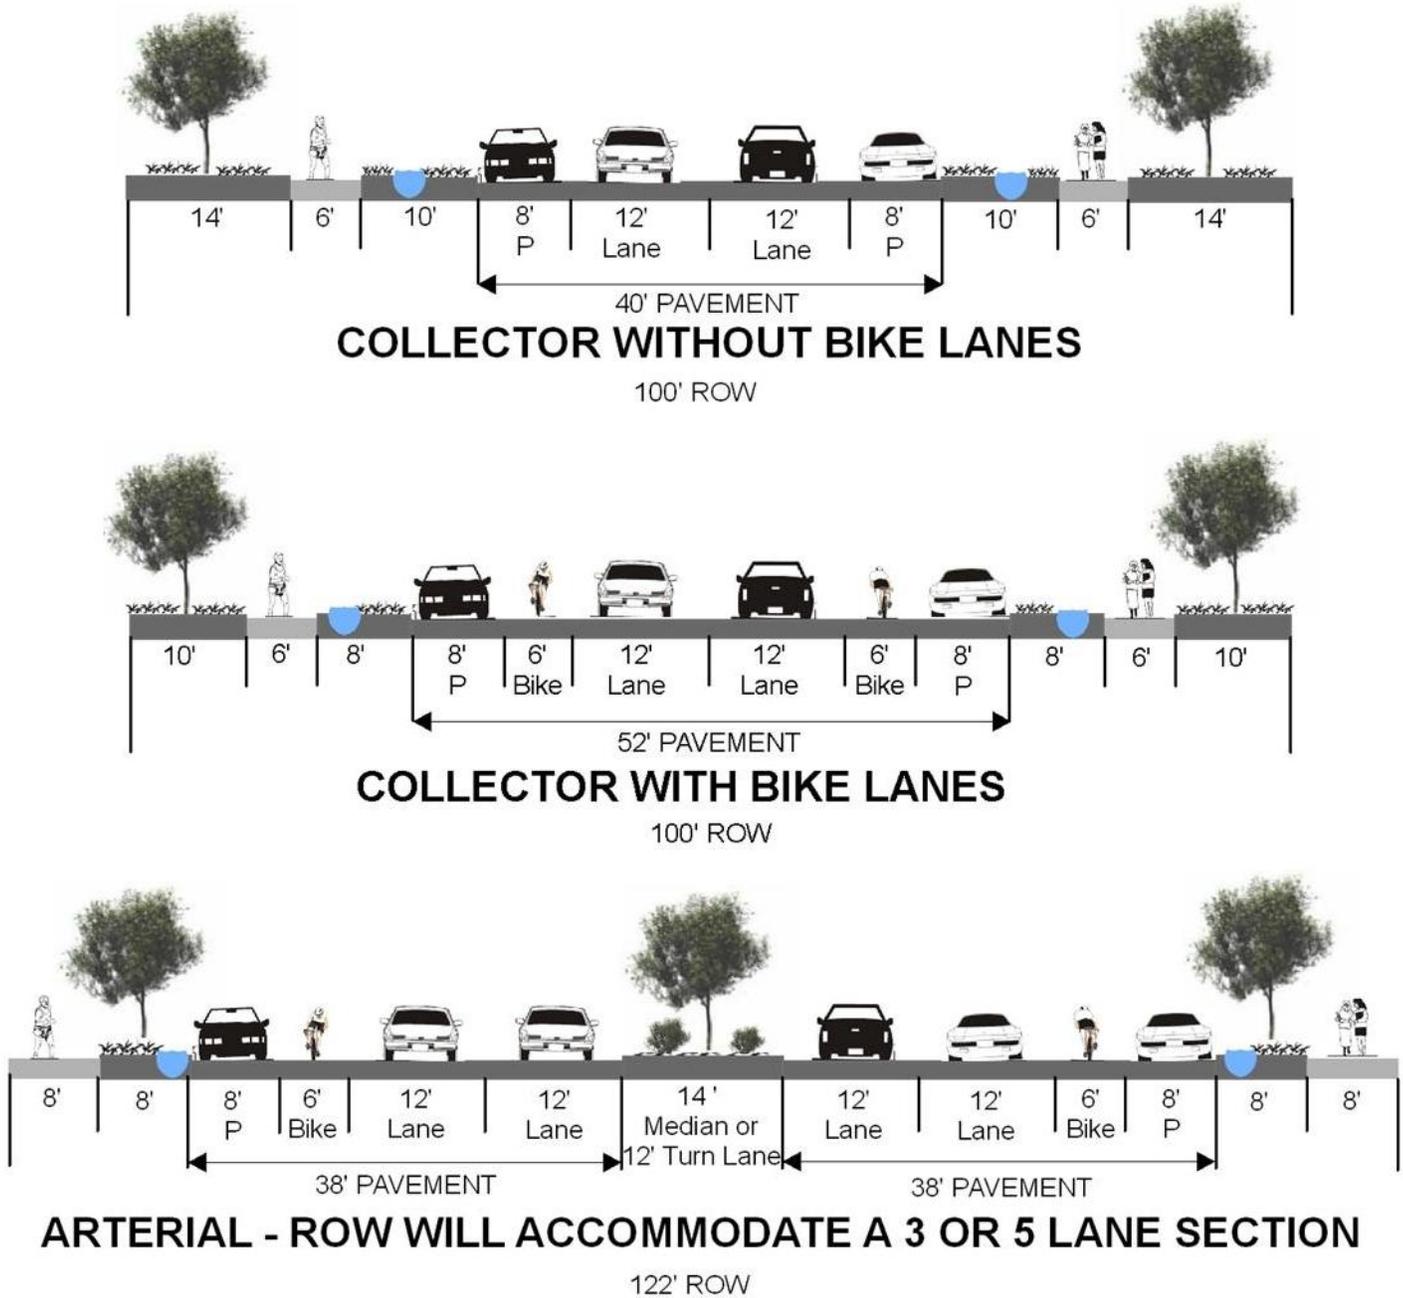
ROAD CONSTRUCTION STANDARDS (CONTINUED)
